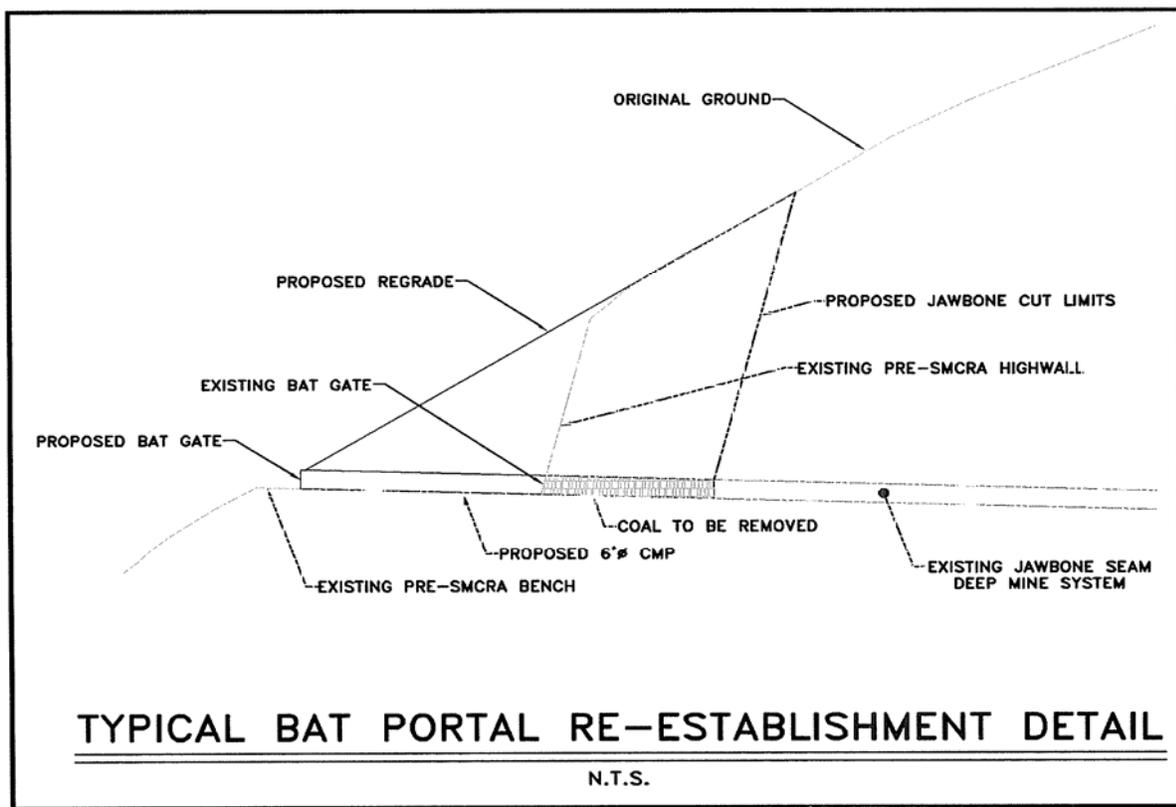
A detail of the proposed on-site mitigation plan proposed in the original permit application.
